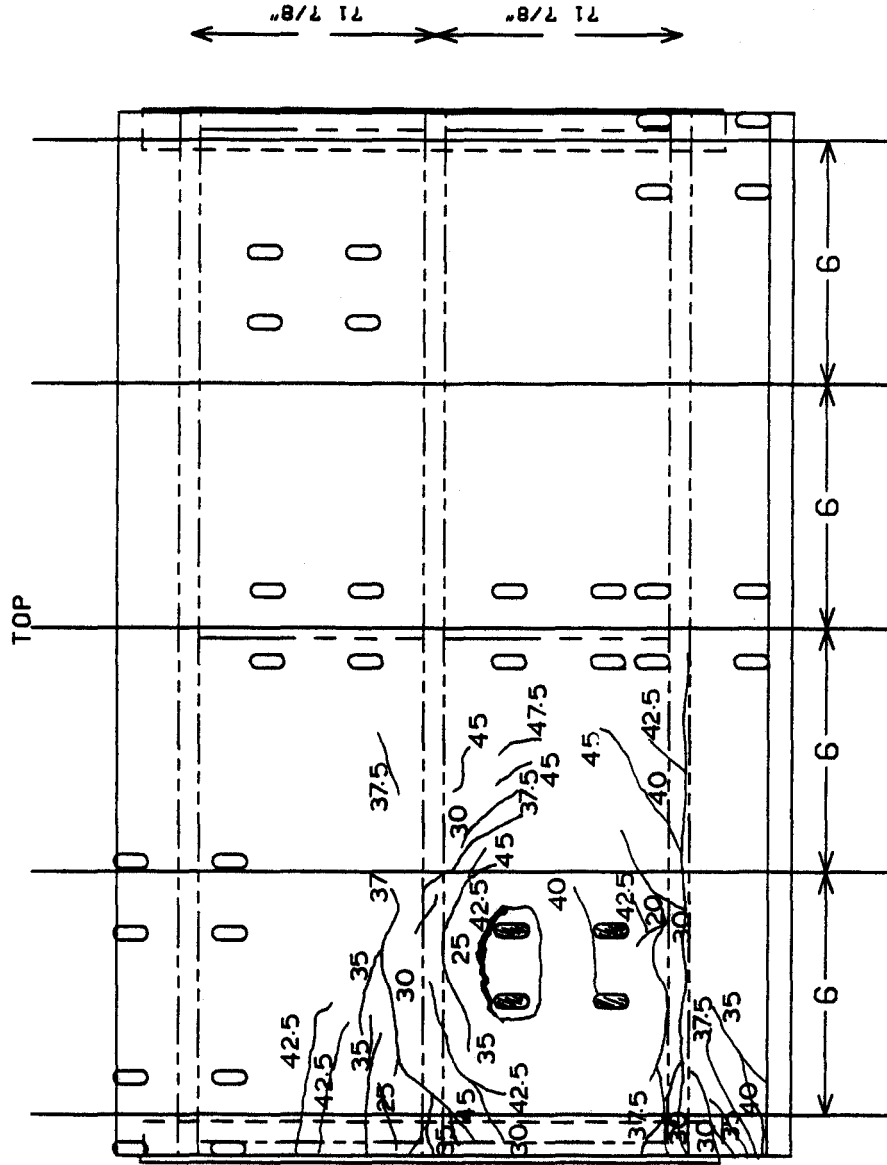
Top Cracking Pattern (Third Bridge - Test No. 7)
